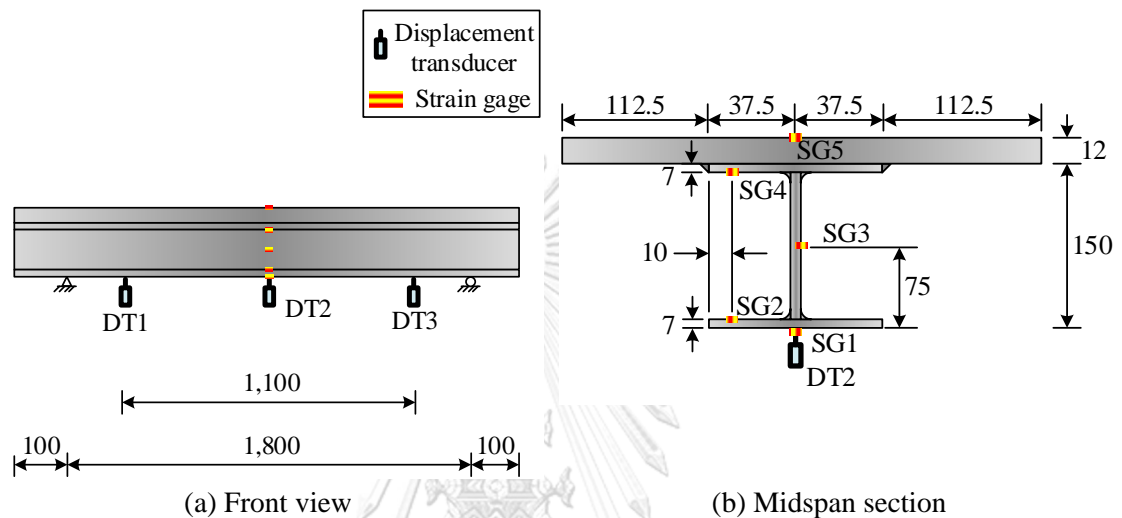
Instrumentation on unstrengthened steel beams (all dimensions in mm).
